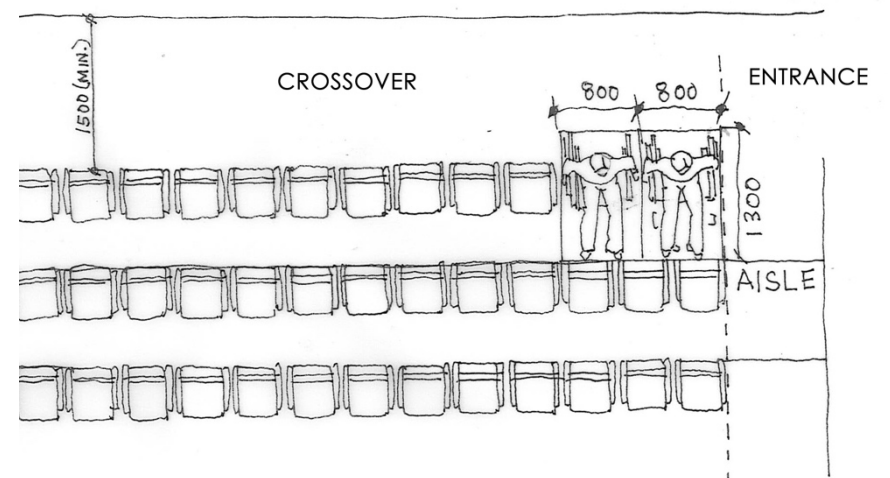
DETAIL PLAN VIEW – wheelchair space in
